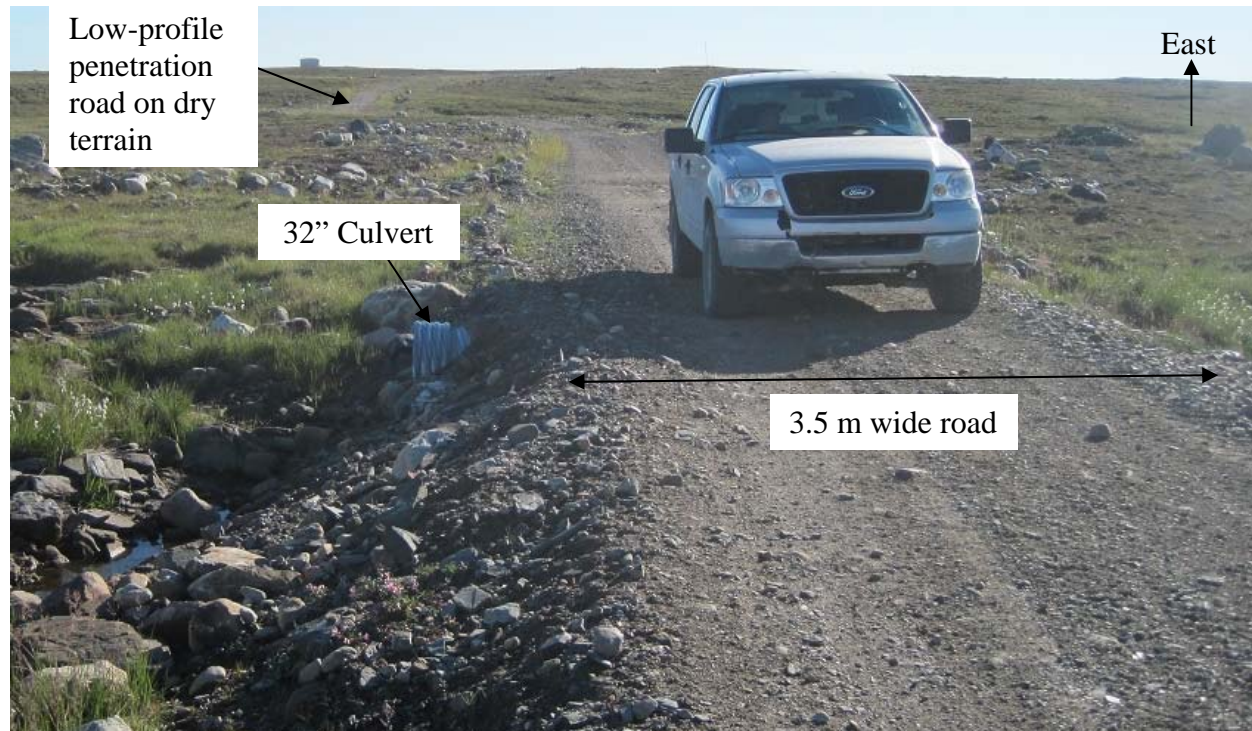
The 3-4 m wide, low profile Diane River Road, looking east from the culvert crossing at KM 16.7 towards the cabin on the deposit at KM 16.0 (Photo: July, 2016).
